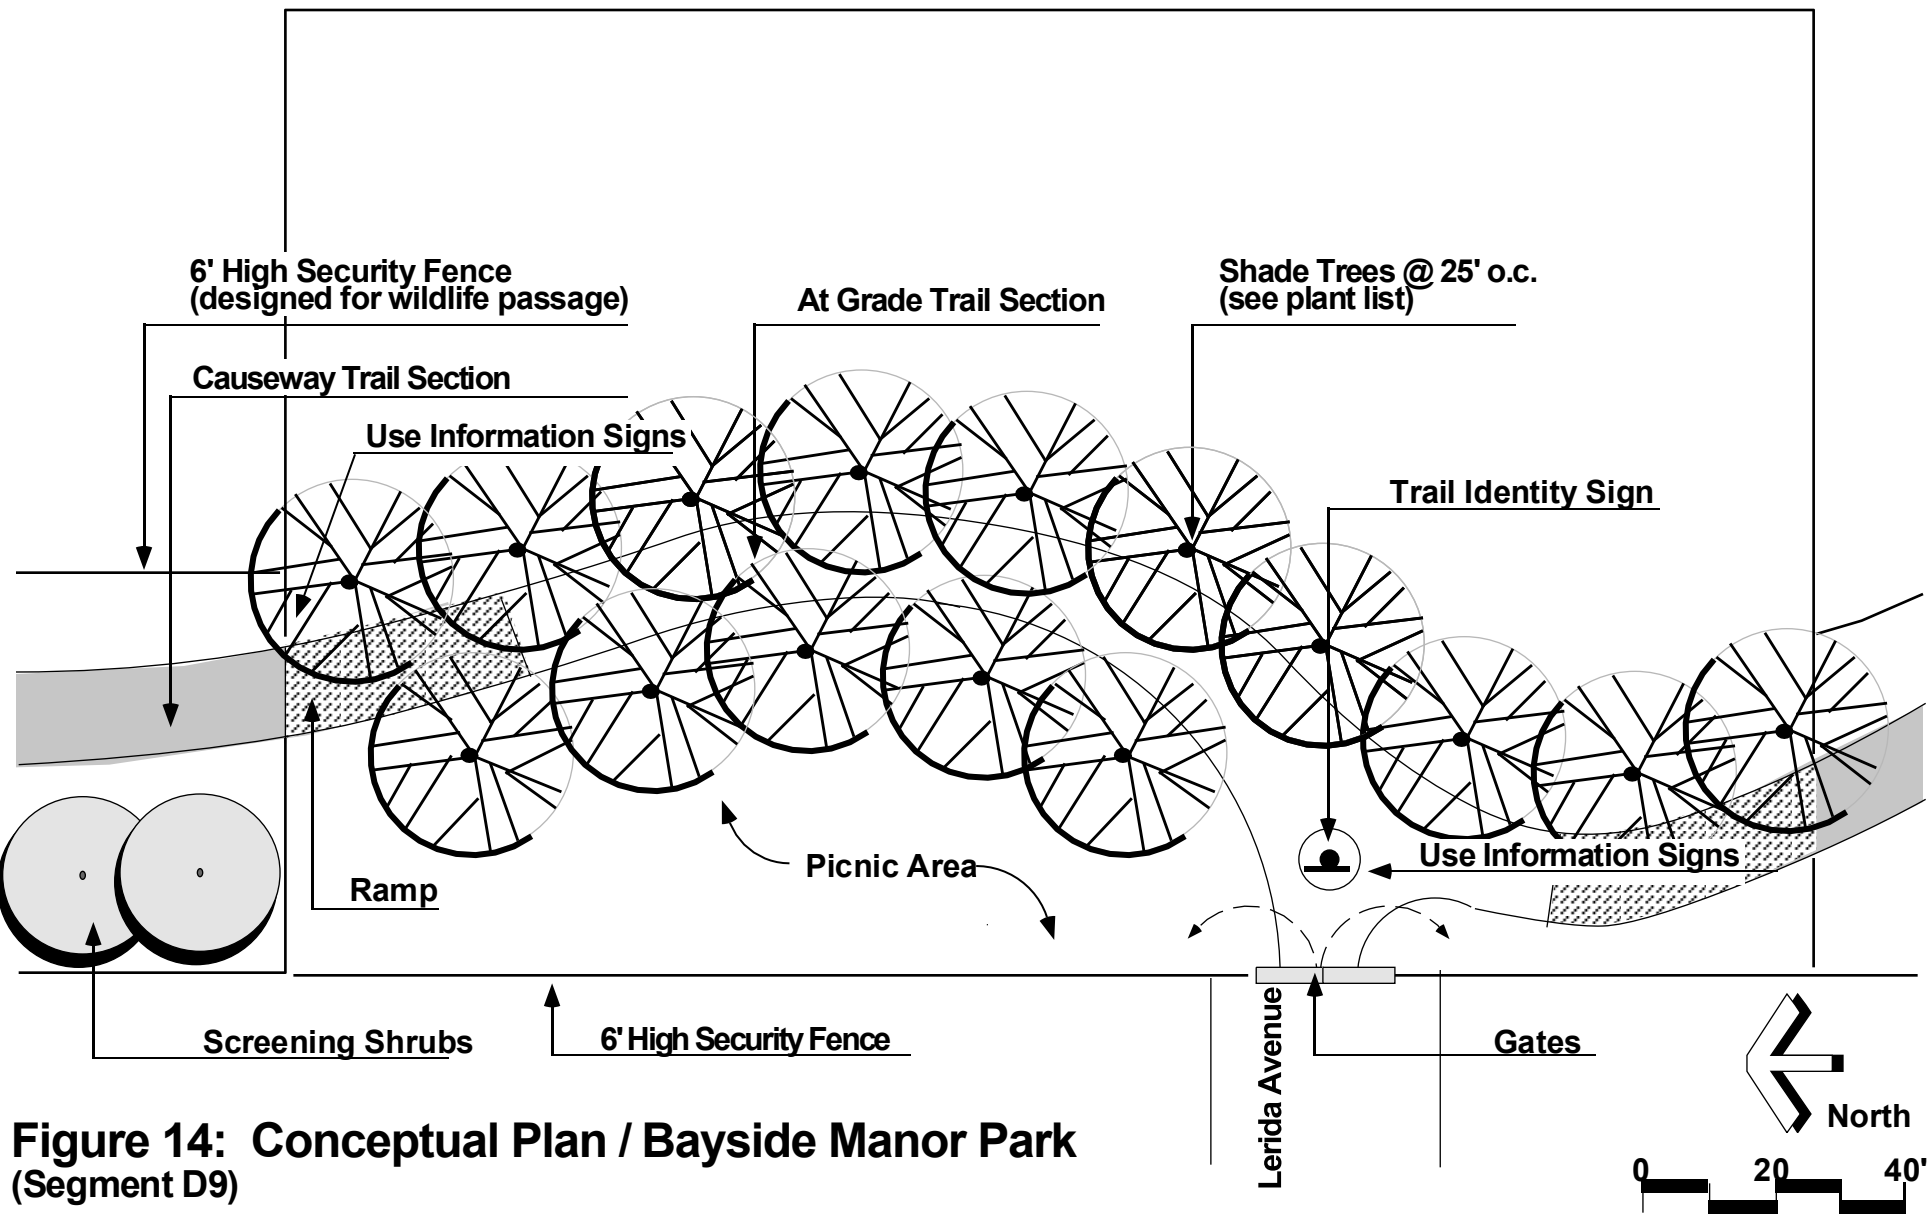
Conceptual Plan / Bayside Manor Park (Segment D9)
